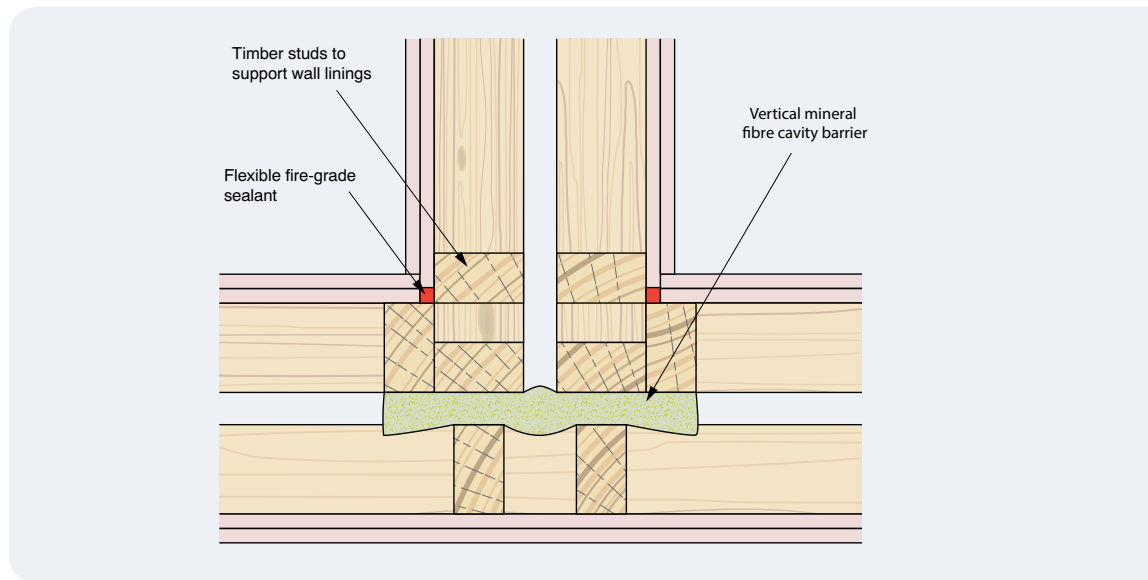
Double stud fire-protected timber internal wall intersection.
